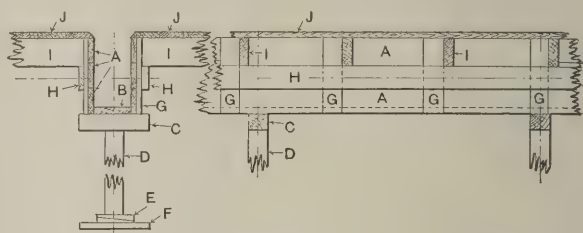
Section and Elevation of Typical Beam and Girder "Form."
